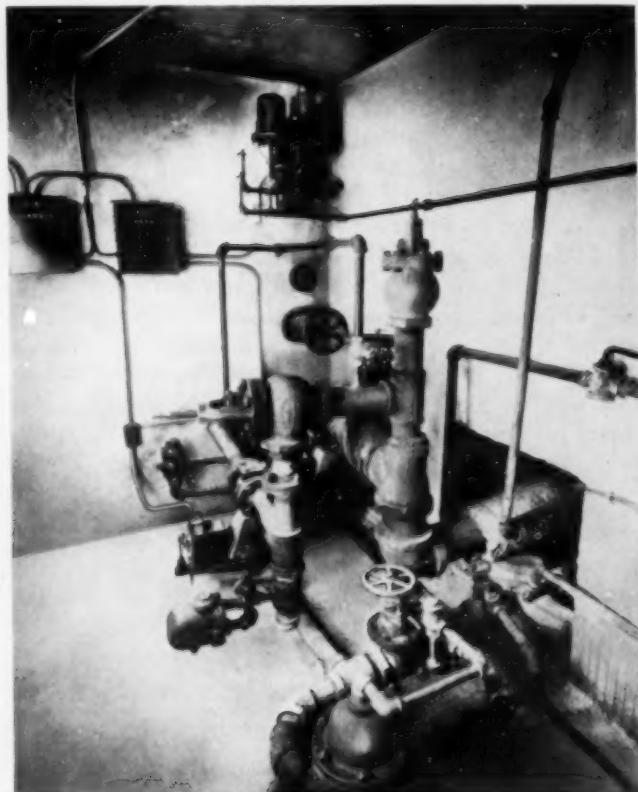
Typical equipment room showing the control valve near floor at right and control cabinets for two zones on the wall.
